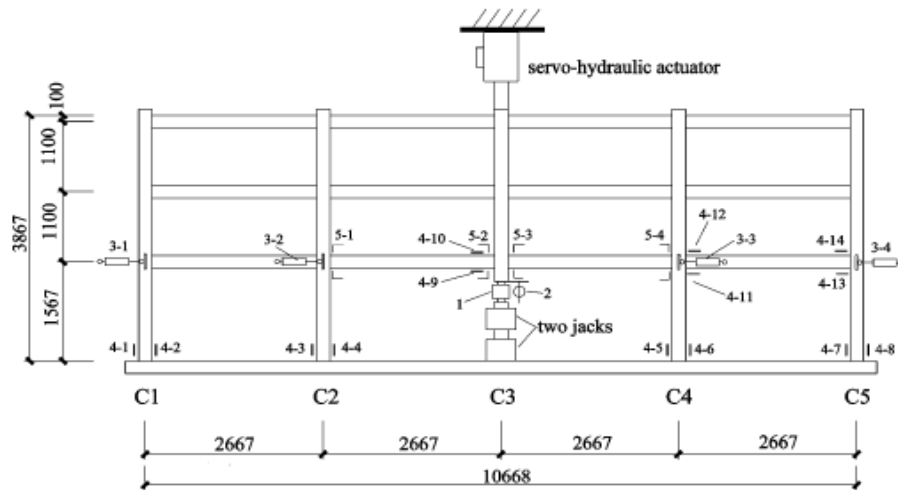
details of model frame and instrumentation layout (Yi et al., 2008)
